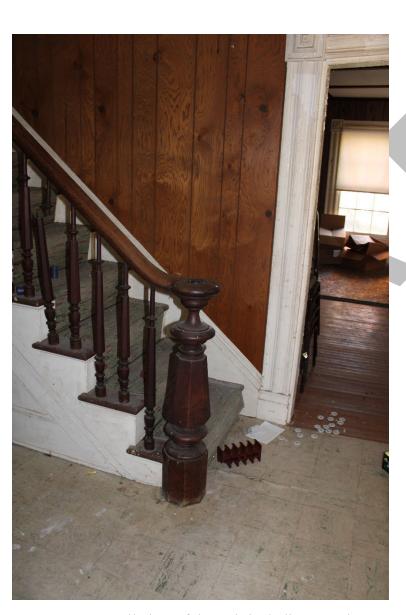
Detail view of the stair including newel post and balusters beyond, camera facing north.
